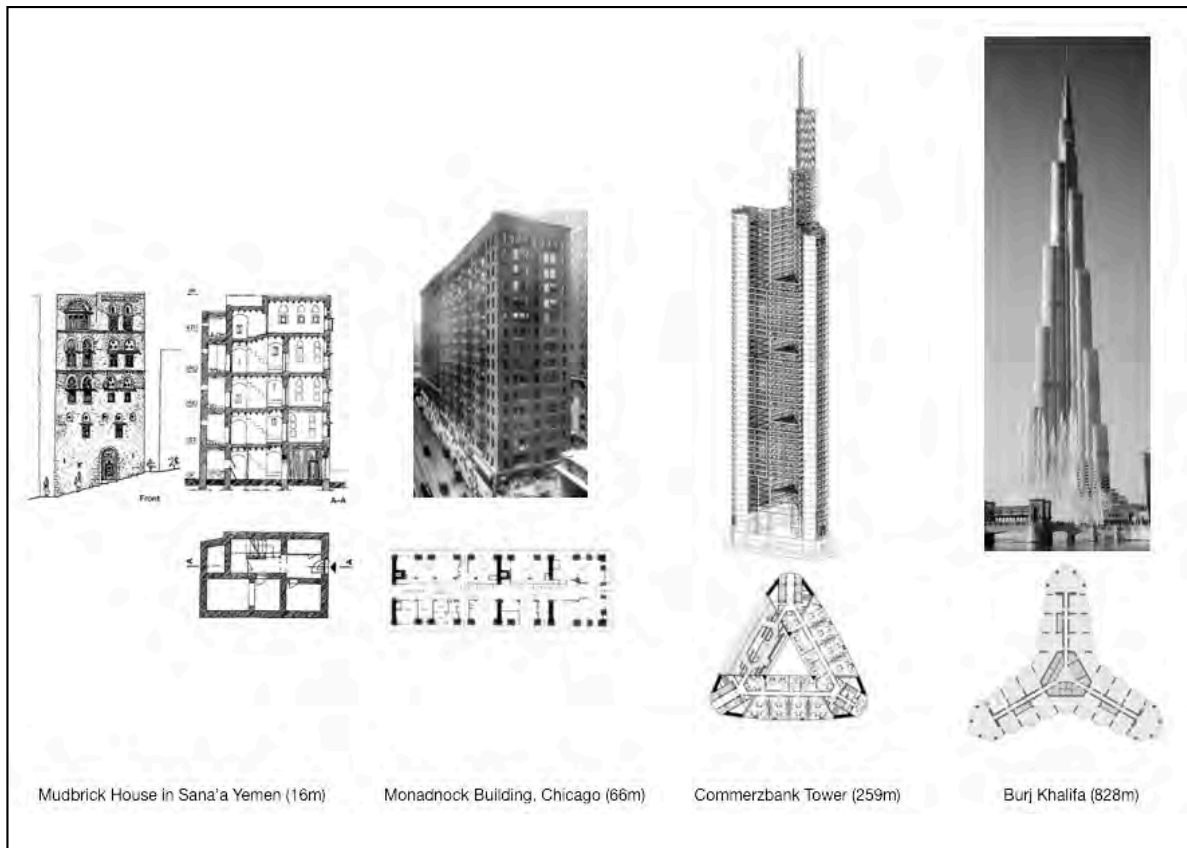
Evolution of Bearing Wall Structure in Tall Buildings
